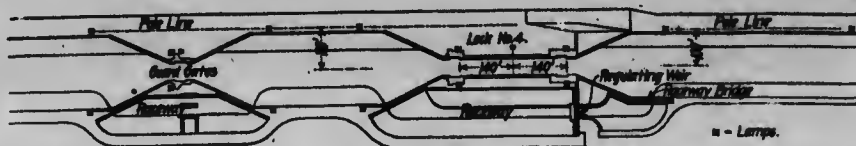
DIAGRAM PLAN OF LOCK NO. 4 AND GUARD GATE; SOULANGES CANAL WORKS, CANADA.
